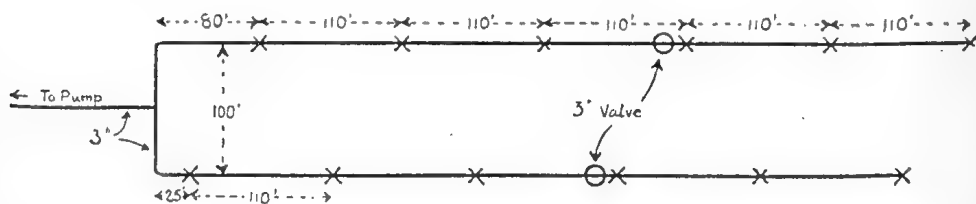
Plan of the Pipe-line System installed at Ayr for Experimental Purposes.
